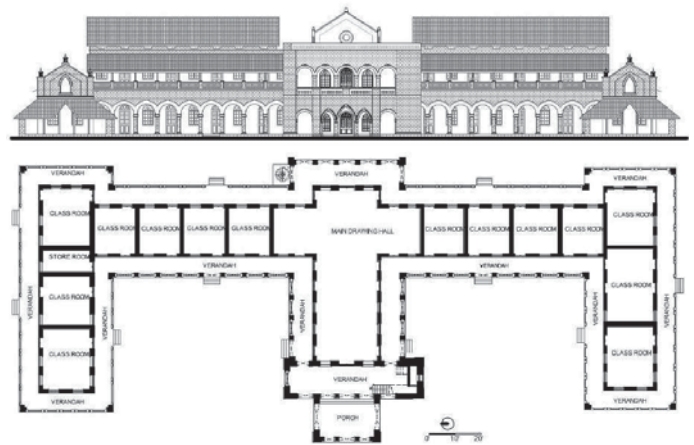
Northcote High School: Front West Elevation and Ground Floor Plan
